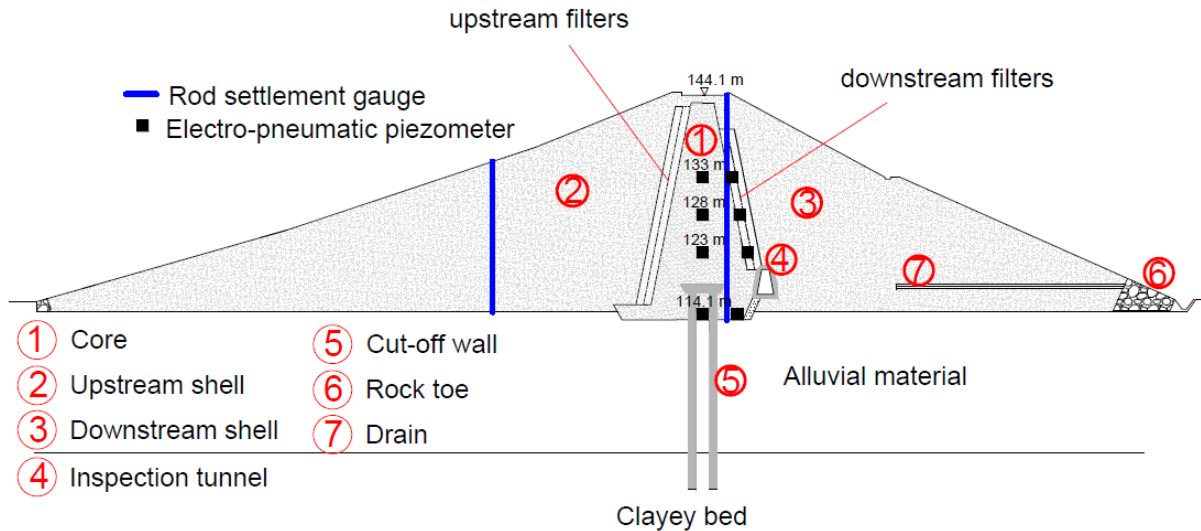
Instrumented cross section 4 of the Farneto del Principe dam.
